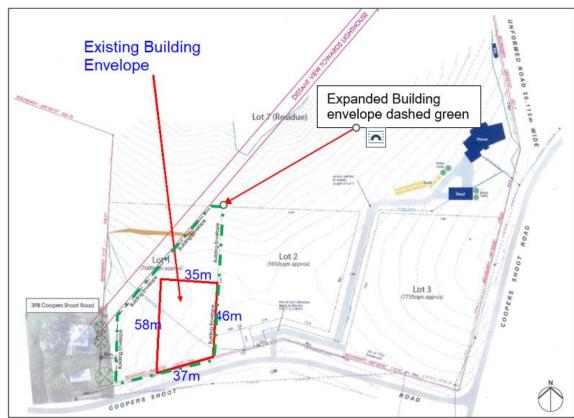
Deposited Plan extract – Building Envelope Lot 1 DP 1283631 (as approved and registered on title)
